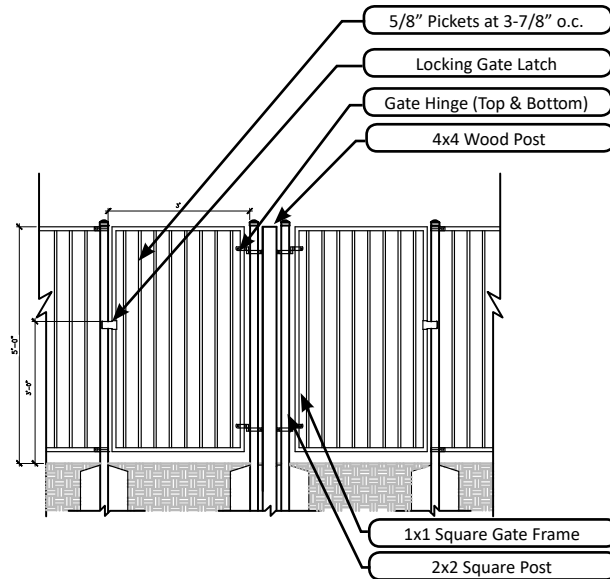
Prototypical Fence Conditions (For Builder/Developer)
